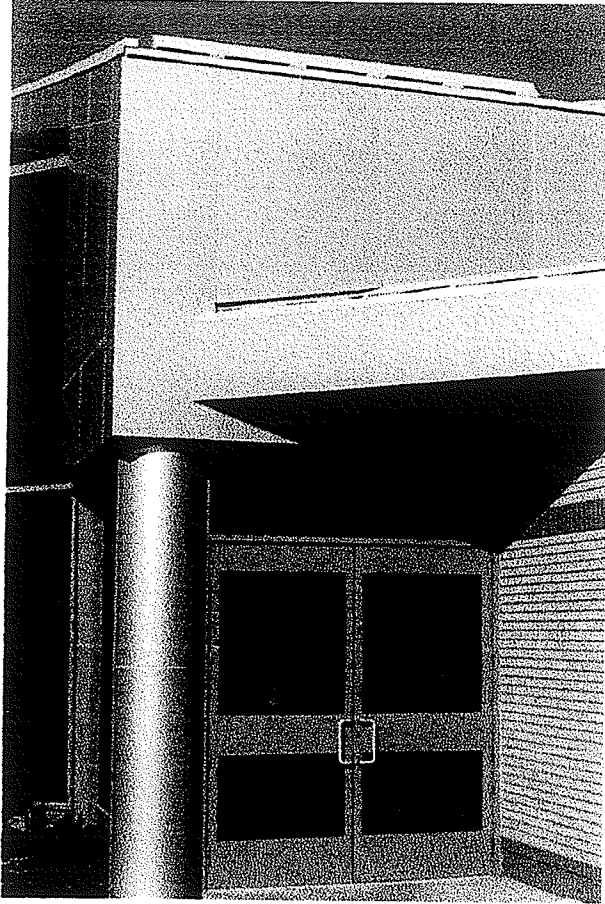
Exterior photograph 16, RDCU building, First Avenue entrance
